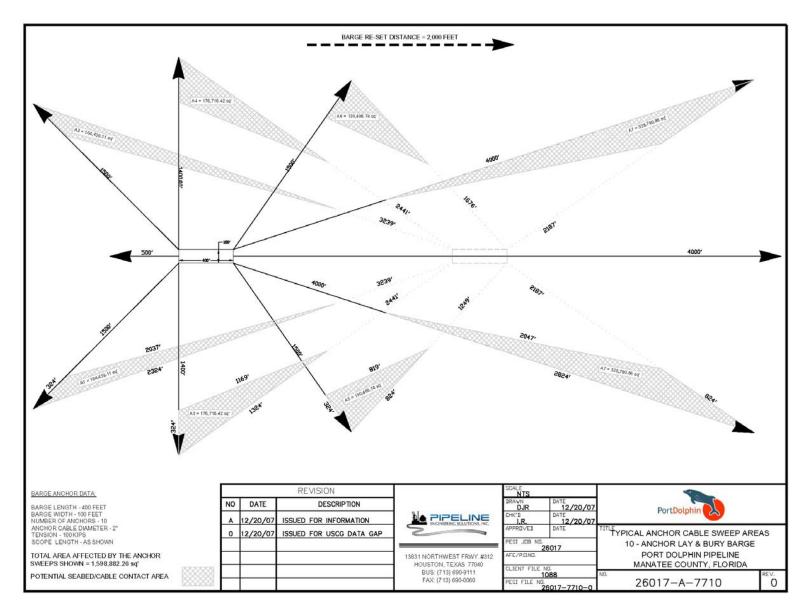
Diagram of seafloor areas swept by anchor cables from a typical pipelaying barge.
